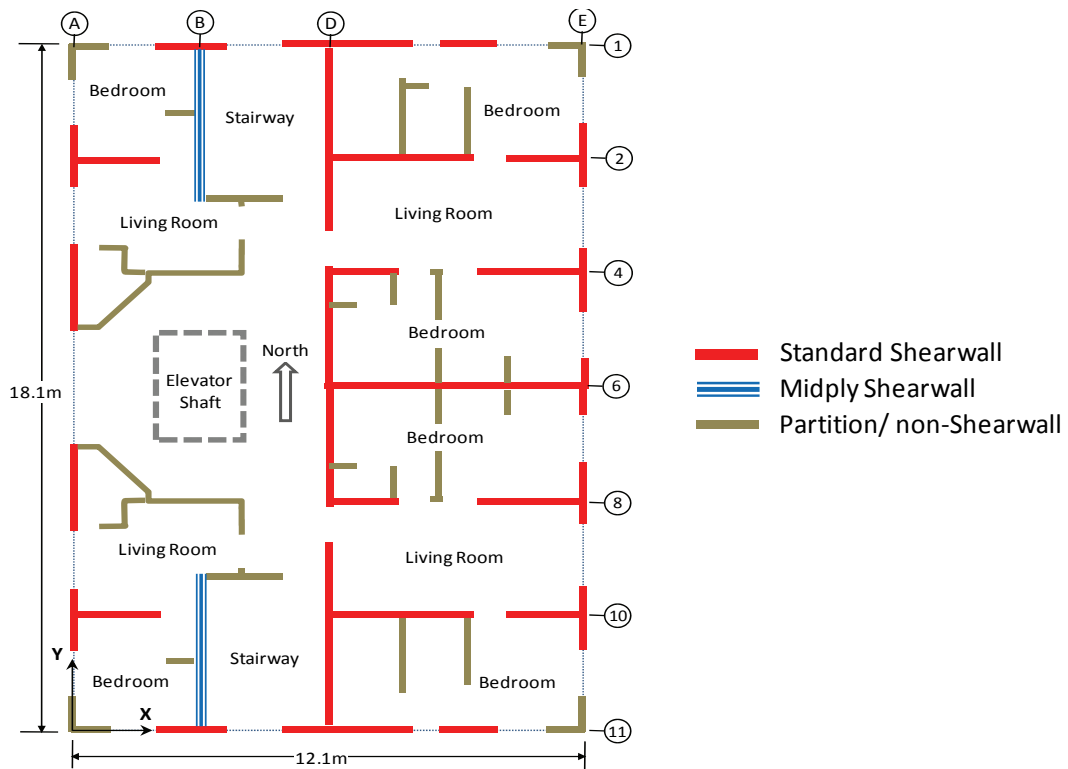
Plan view of the six-story NEESWood Capstone Building for 6th floor.
